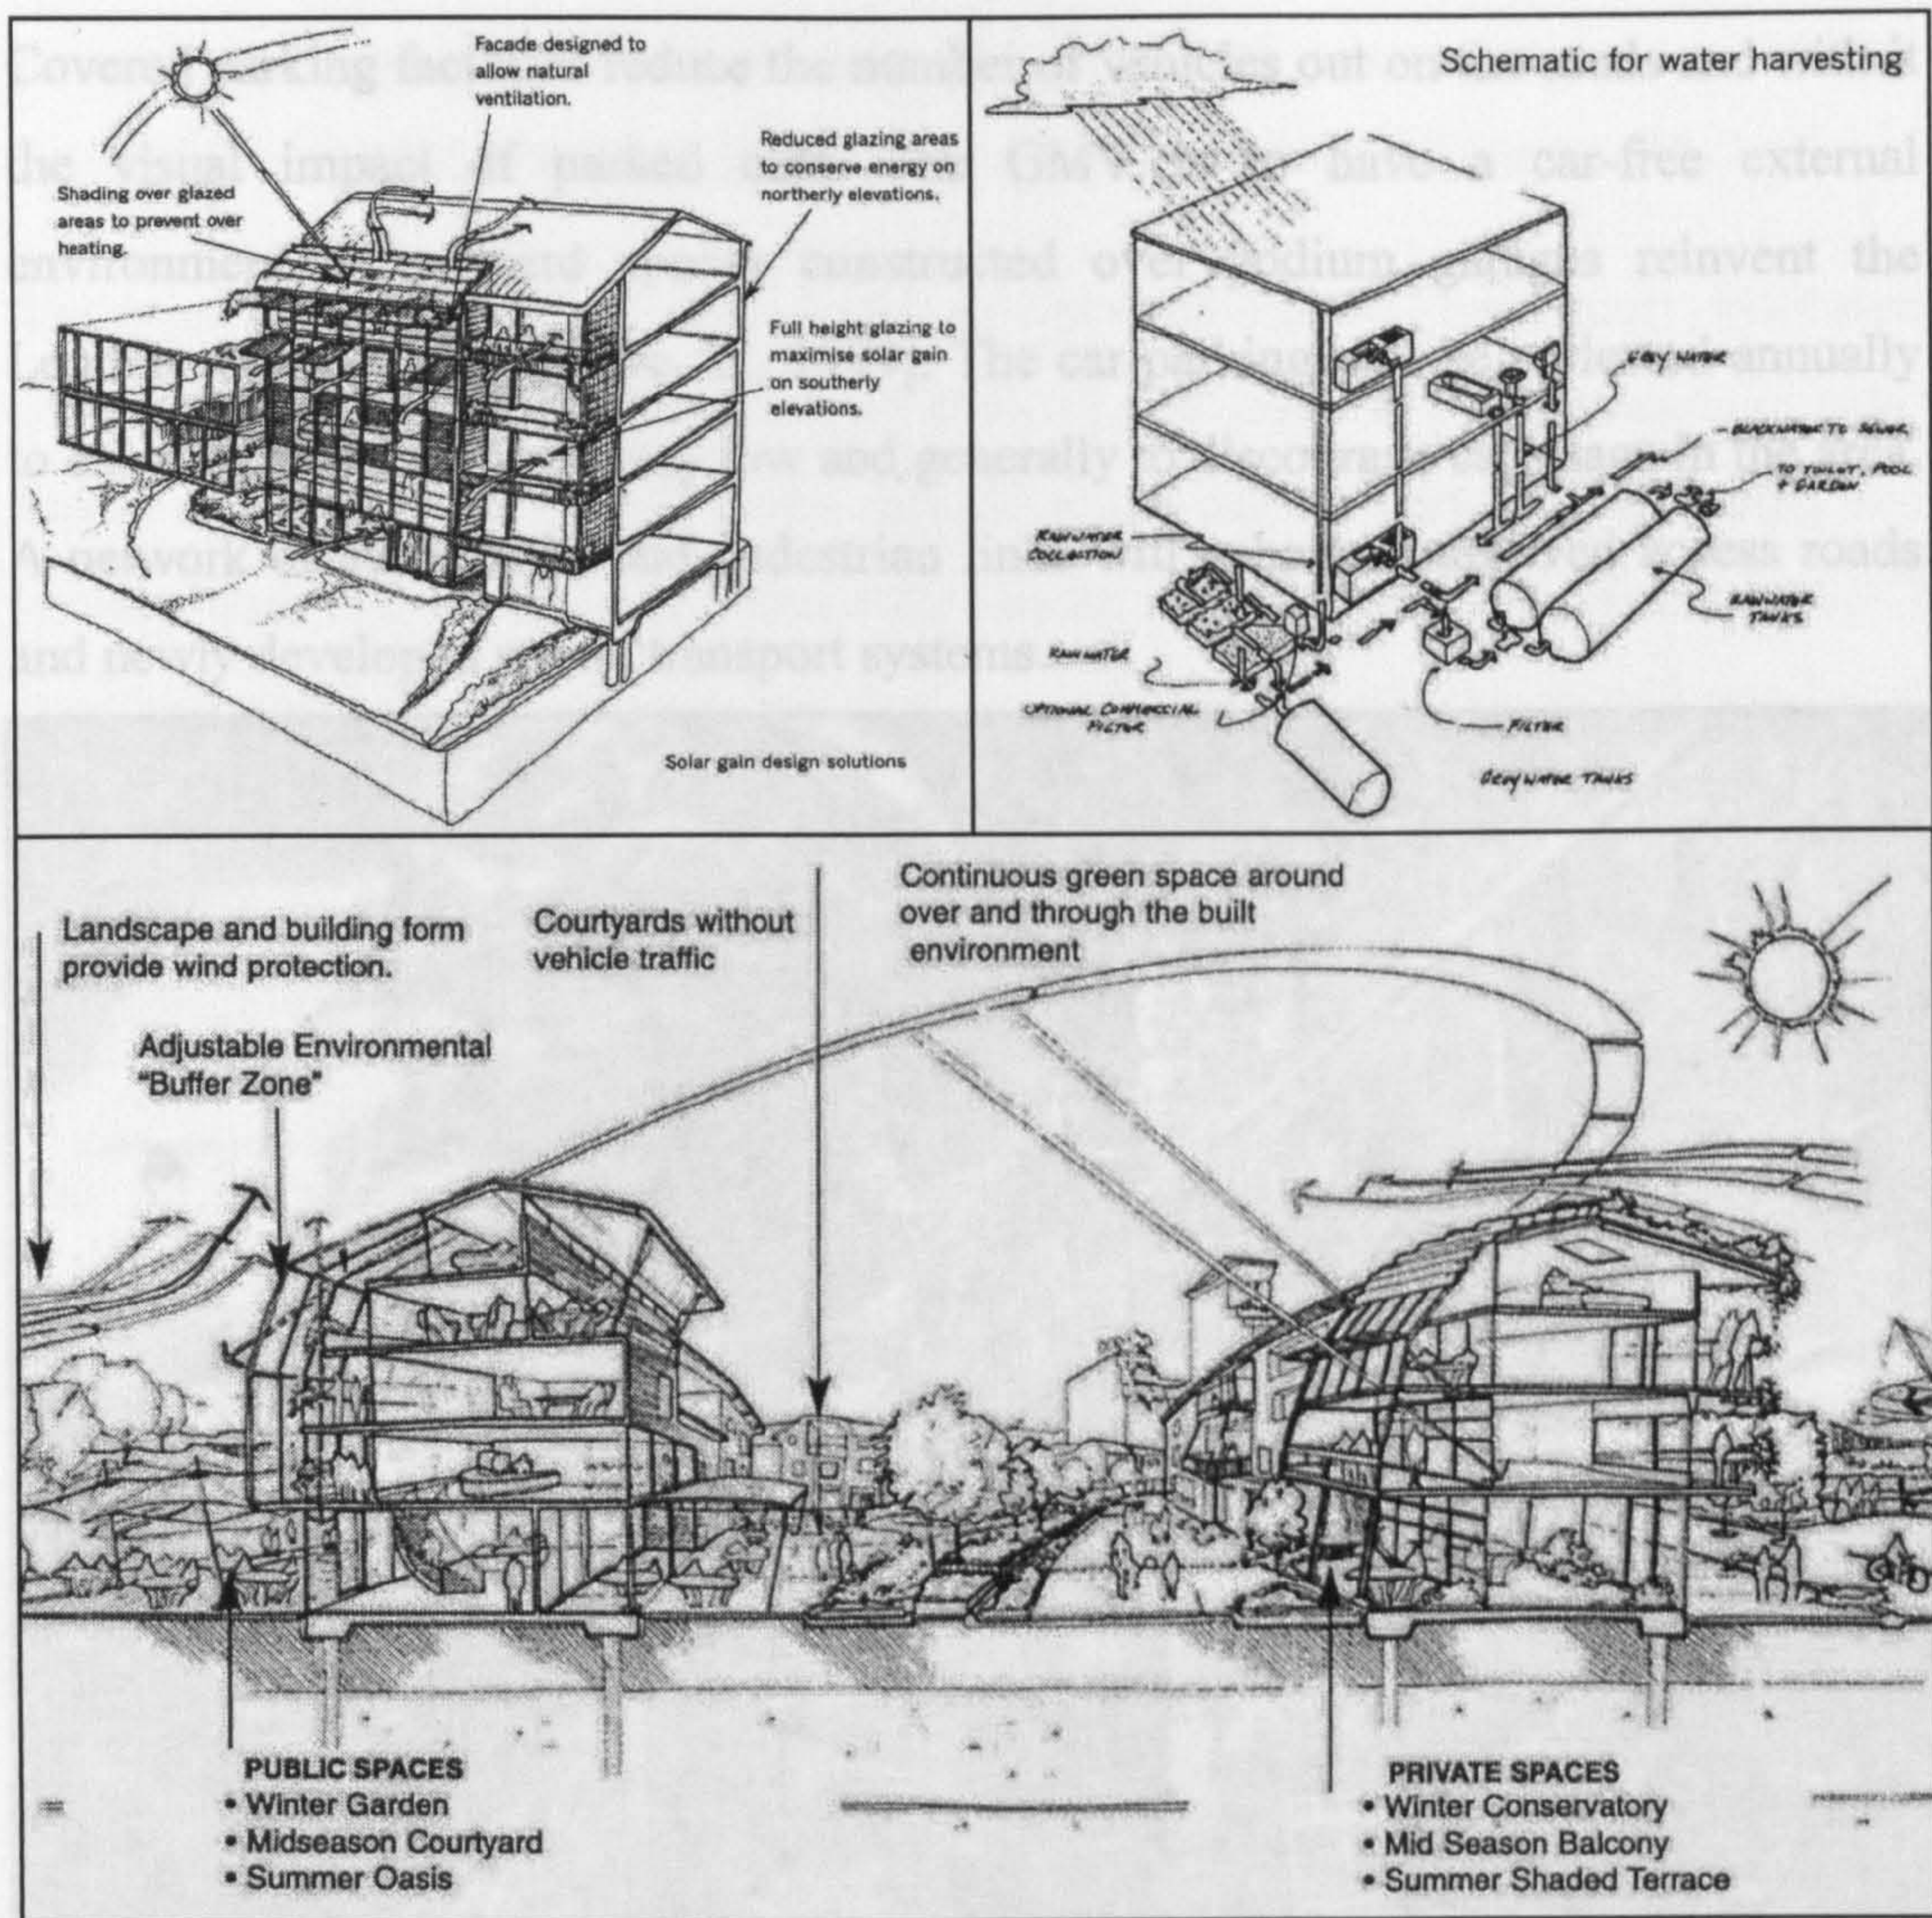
Top (L) – Solar gain system, Top (R) – Proposed Grey Water Recycling system, Bottom - Detail of breathing façade elements.
